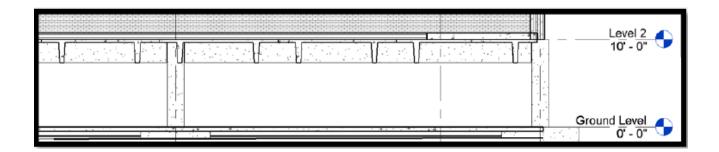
Precast Double Tee Roof concrete slab (Alvarez & Gomez 2013)
